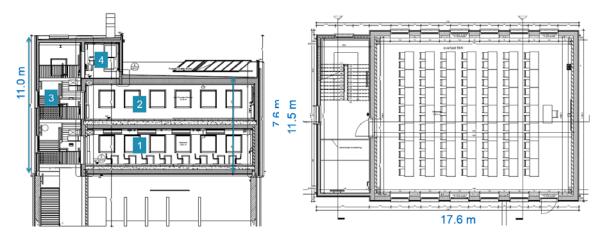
Section (left) and floor plan (right) of the test lecture rooms on KU Leuven Technology campus Ghent
